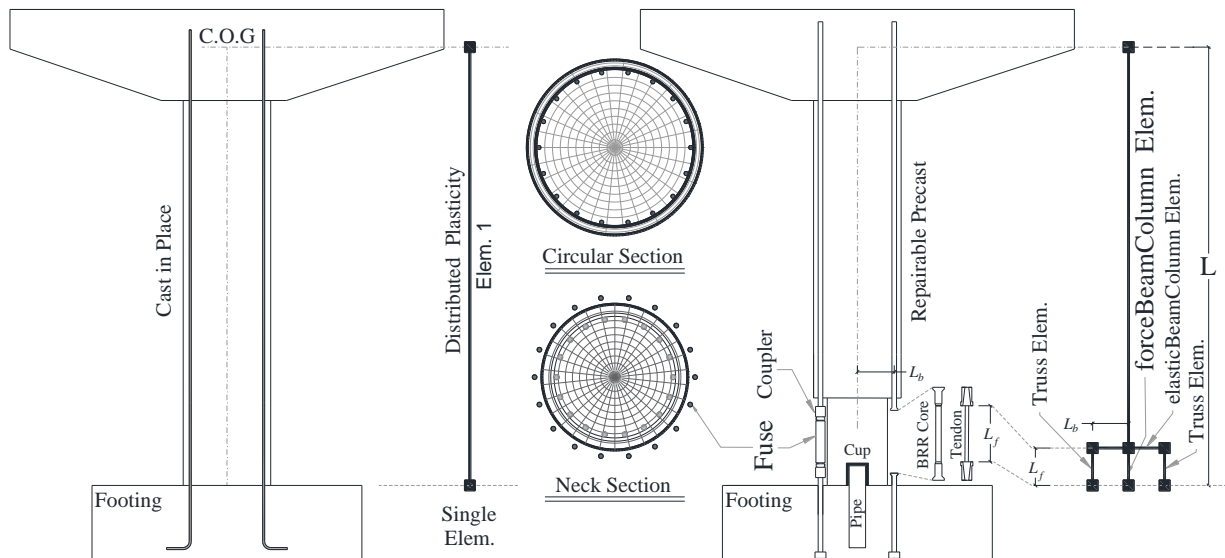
Full-Scale Cast-in-Place and Repairable Bridge Column Models
